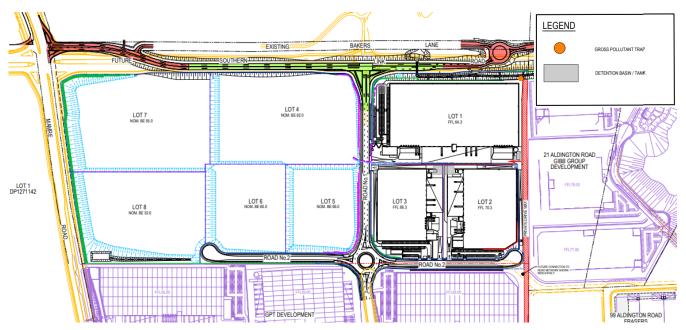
Stormwater Management Plan – Ultimate Arrangement
